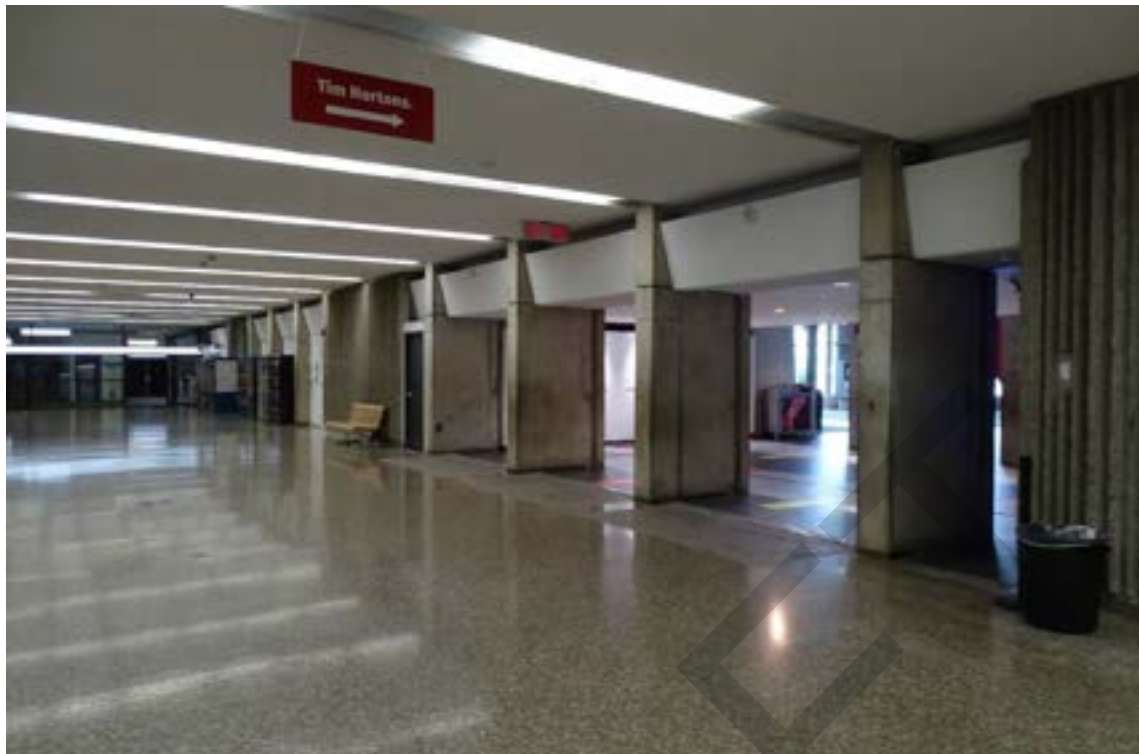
View from marshalling hallway toward lobby, vertical concrete slabs remain extant and the concrete walls/finish remain intact
